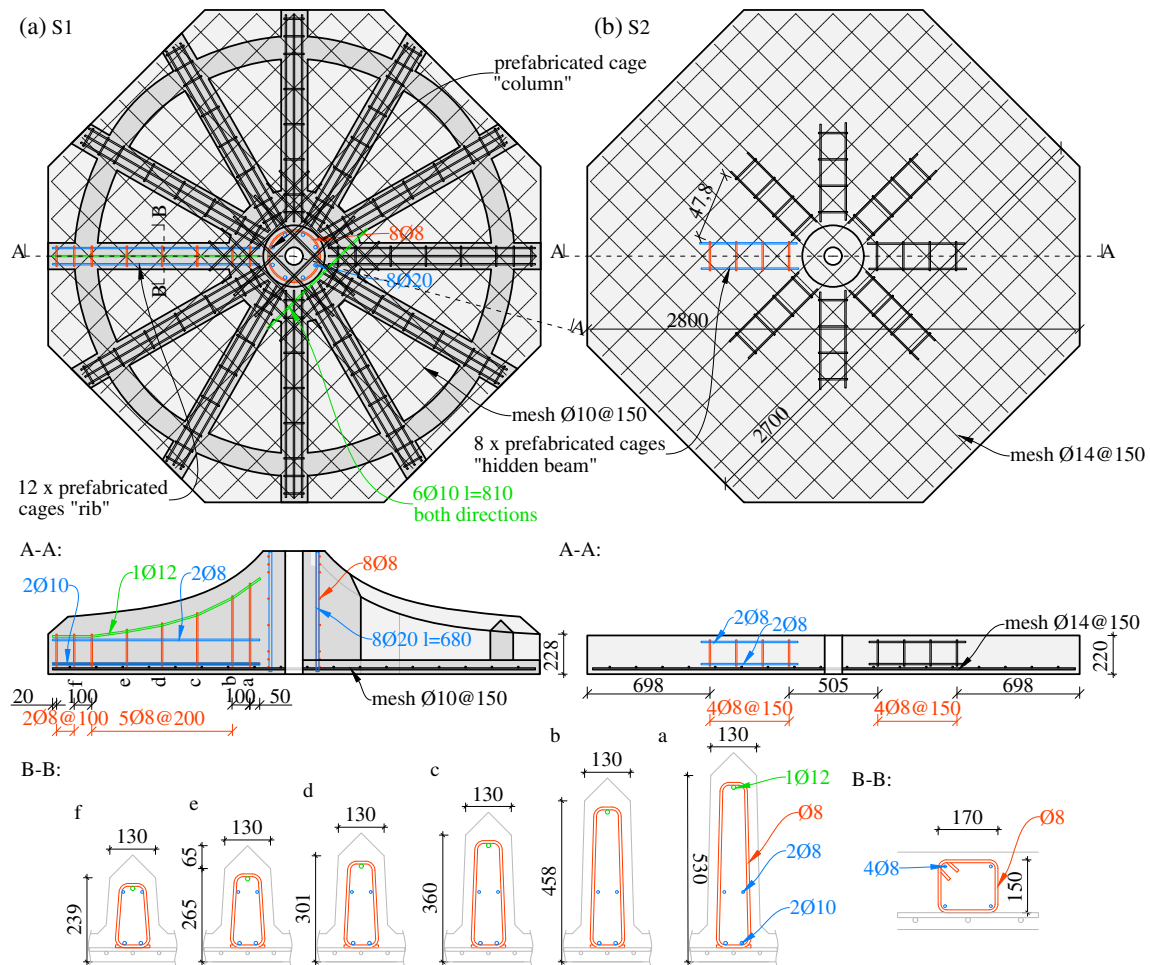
Reinforcement layout of the specimens (a) S1: transition from slab-to-column and (b) S2: solid slab specimen.
